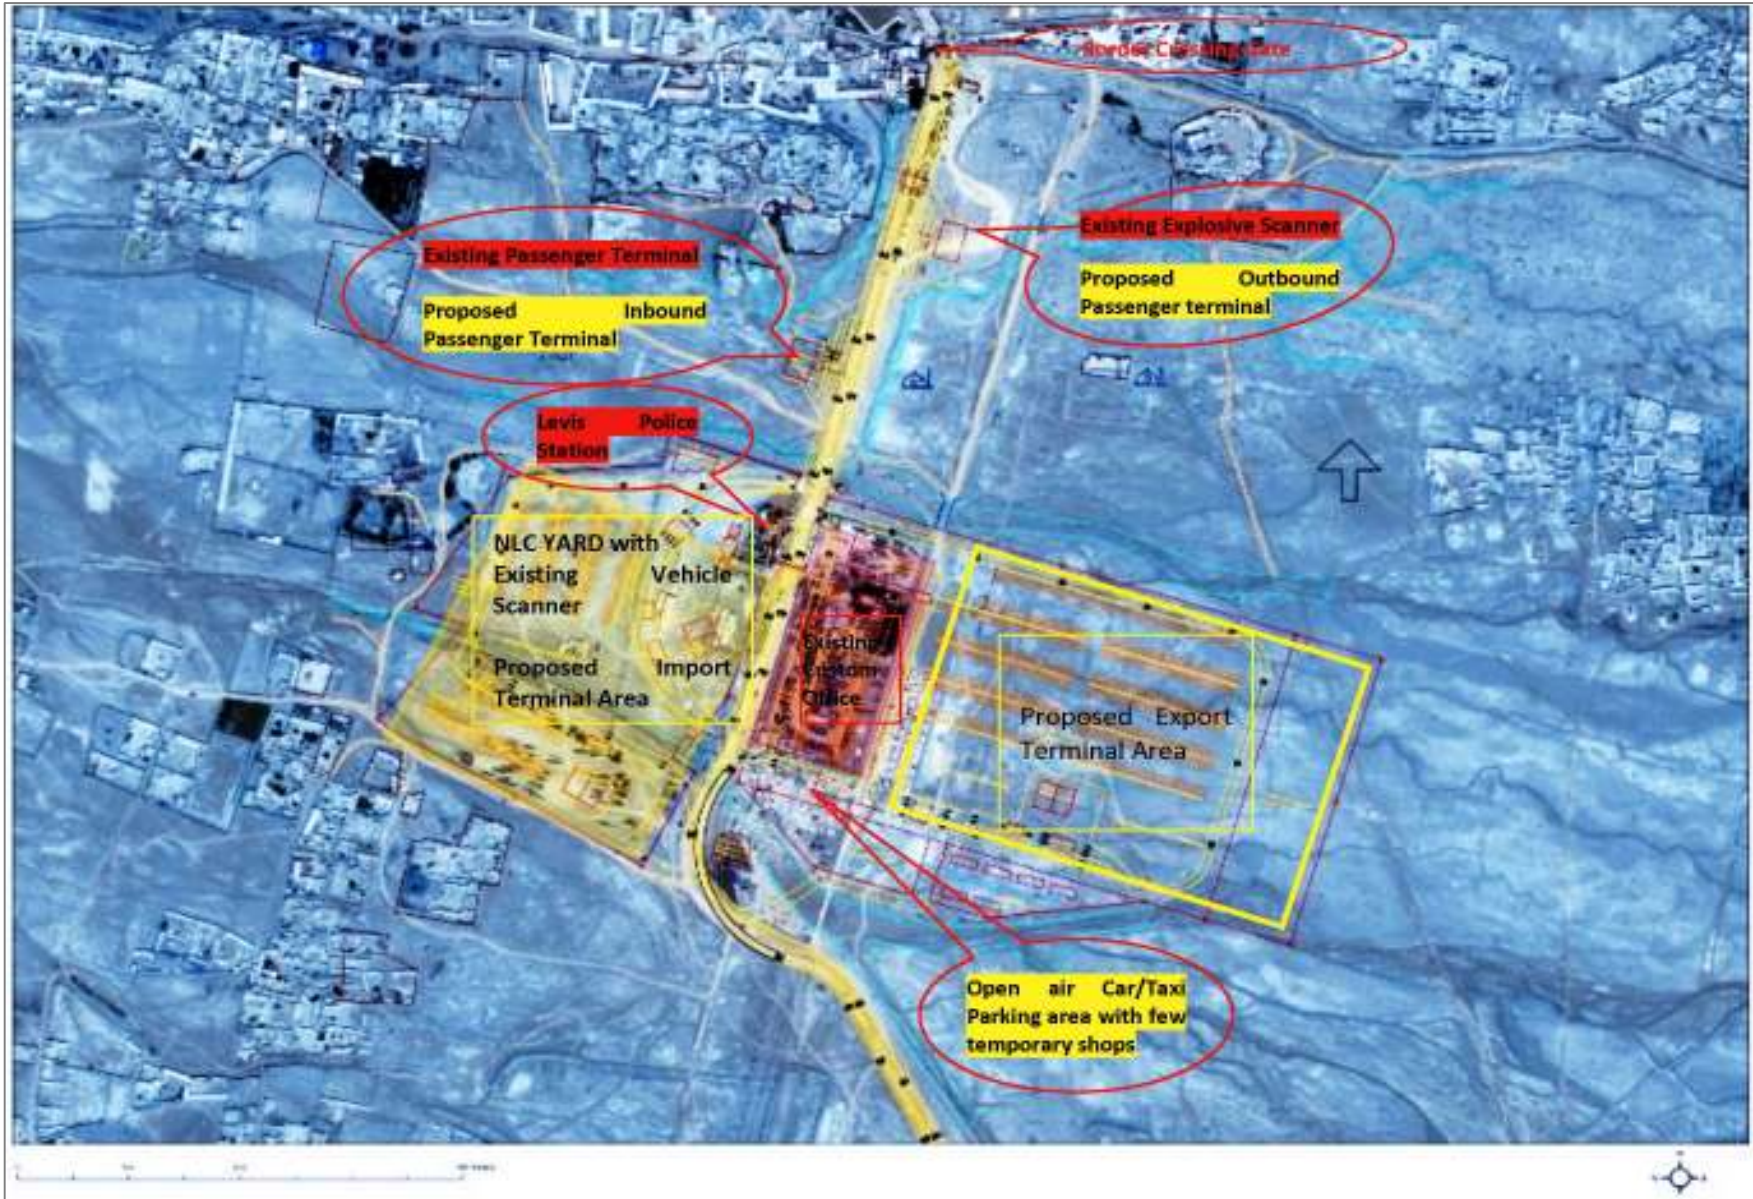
Image Showing Layout plan with Land to be used for BCP Chaman
